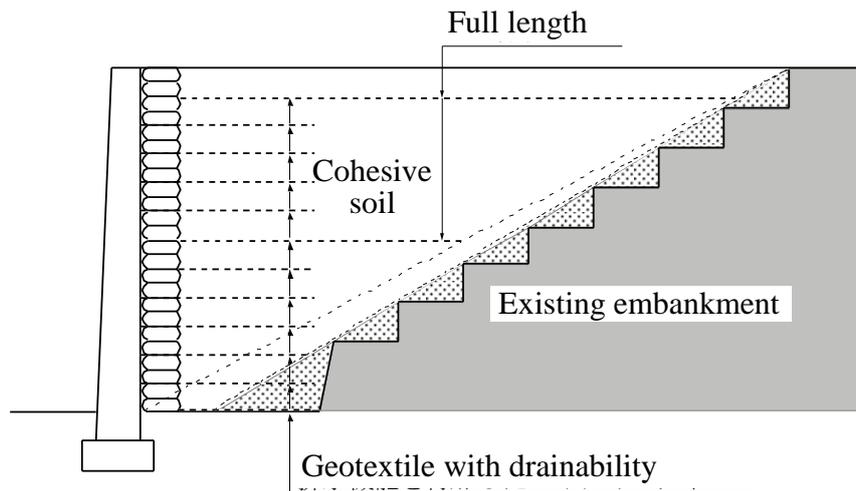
Cross section view of RRR-B structure with cohesive backfill soil
